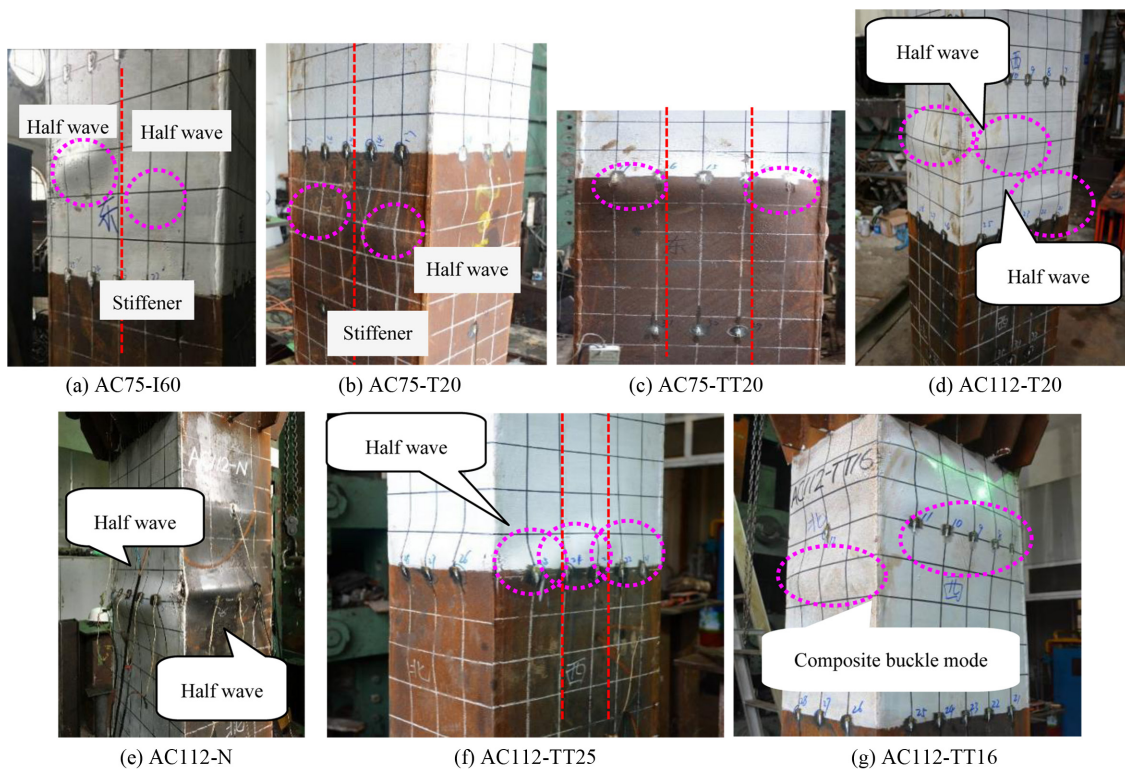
Failure Modes of T-shaped Stiffeners under Axial Compression Load.
